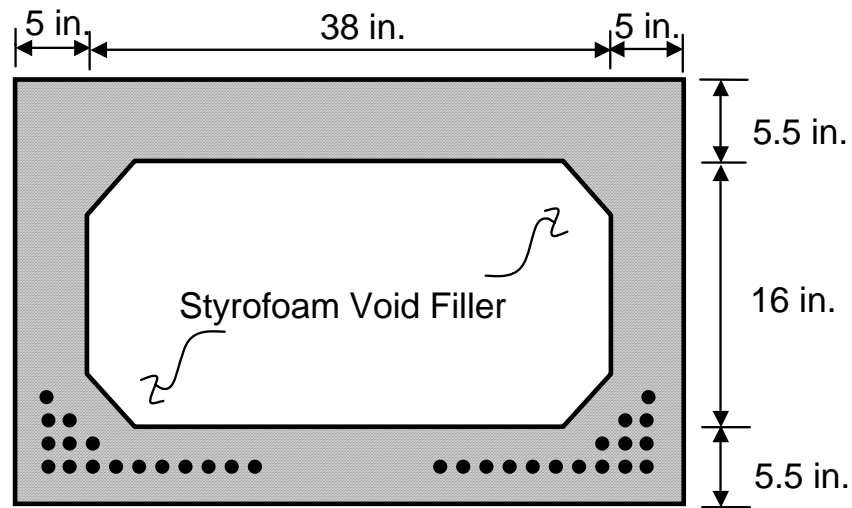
Cross-section of box girders from Heldenfels Brothers, Inc. - San Marcos (Boenig 2000)
